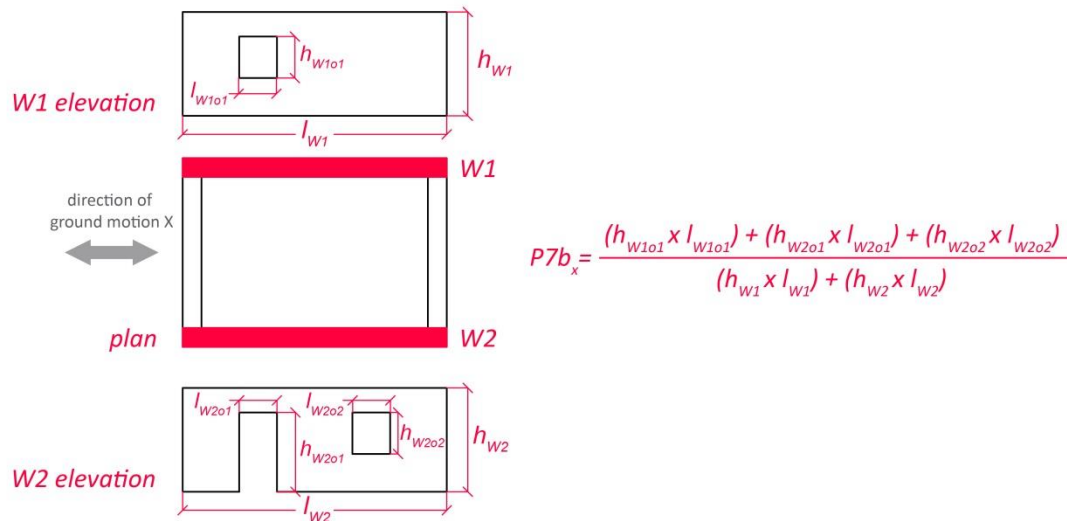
1: Definition of the ratio P7b concerning the area of wall openings in the walls parallel to the loading direction
